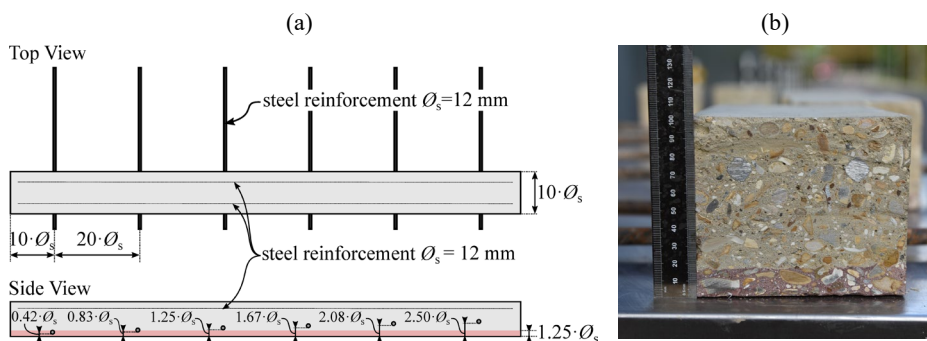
Specimen preparation: (a) Six specimens were cast within one formwork. The concrete cover ranged from $0.42 \cdot \varnothing_s$ (5 mm) to $2.5 \cdot \varnothing_s$ (30 mm) and (b) the specimens were cut after hardening and the actual layer thickness was measured.
